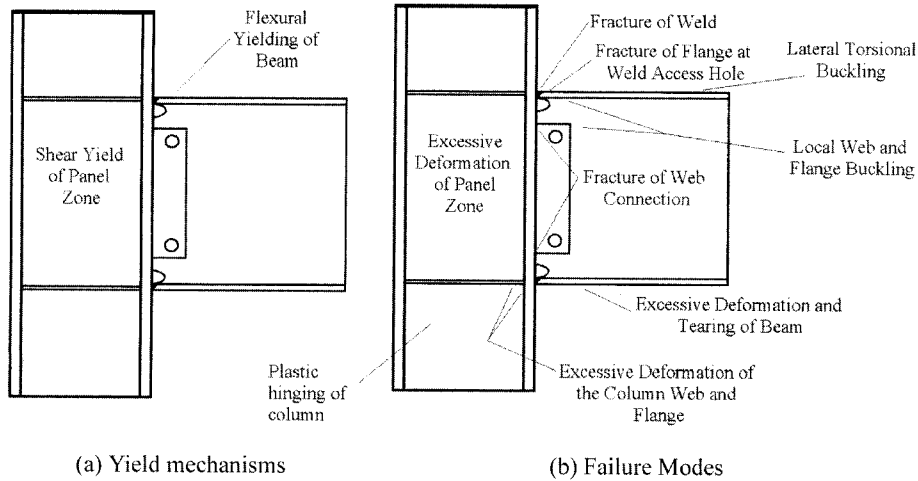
Yield Mechanisms and Failure Modes of WFWW Connection.
